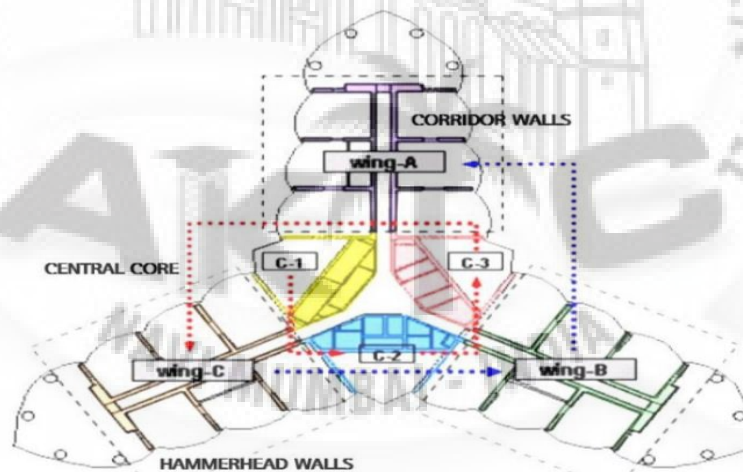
Structural system Burj Khalifa (Source – archichoong)
